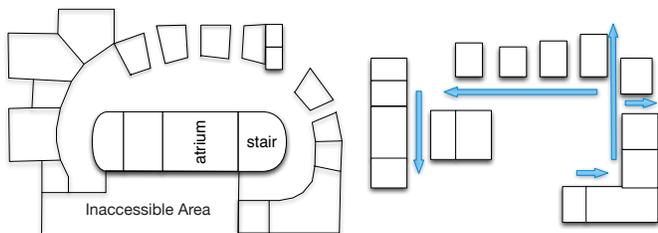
Office building floorplan case study. Left side is the original floorplan and right side is the learned one.
